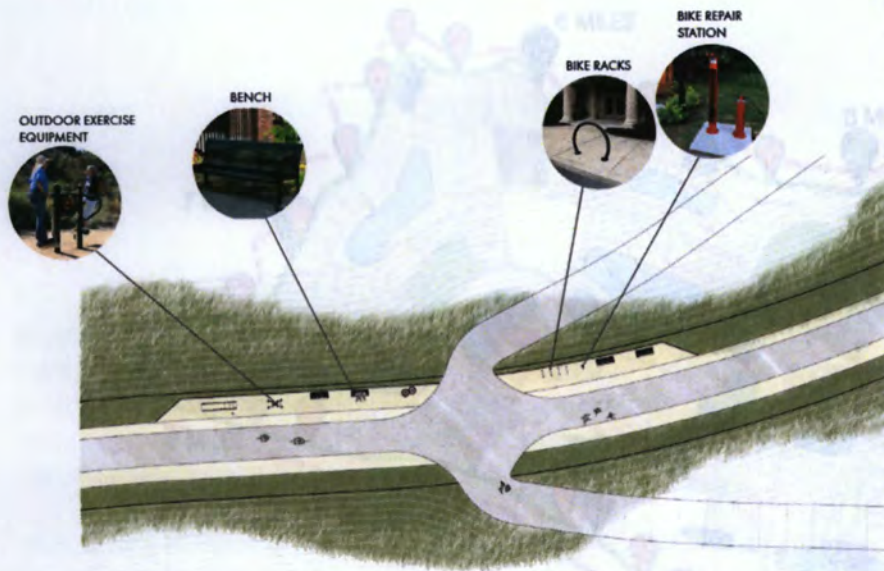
TYPICAL TRAIL PLAN VIEW
